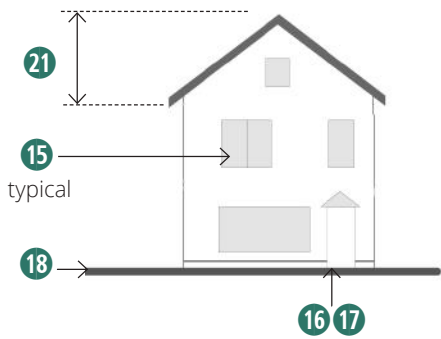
D-3. Commercial Manor Building: Facade Design Requirements
